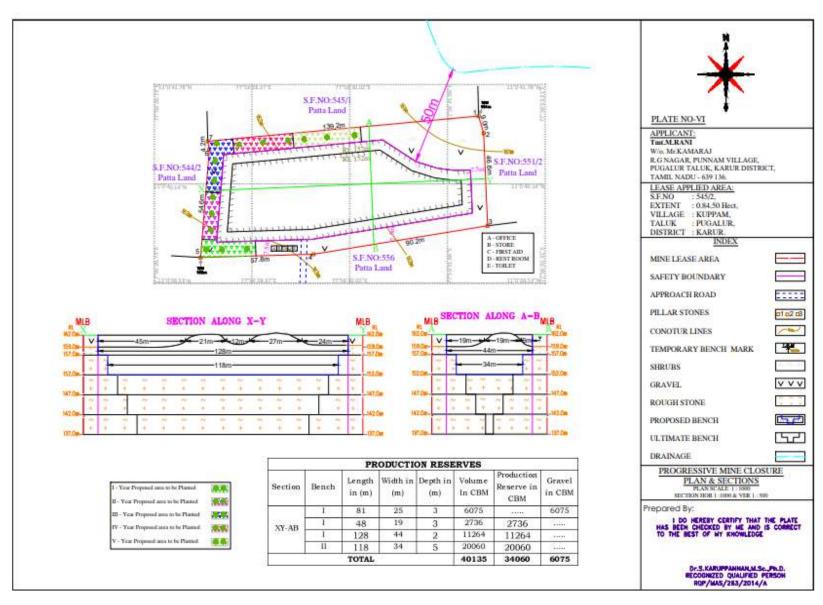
Conceptual Final Mine Closure Plan & Section
